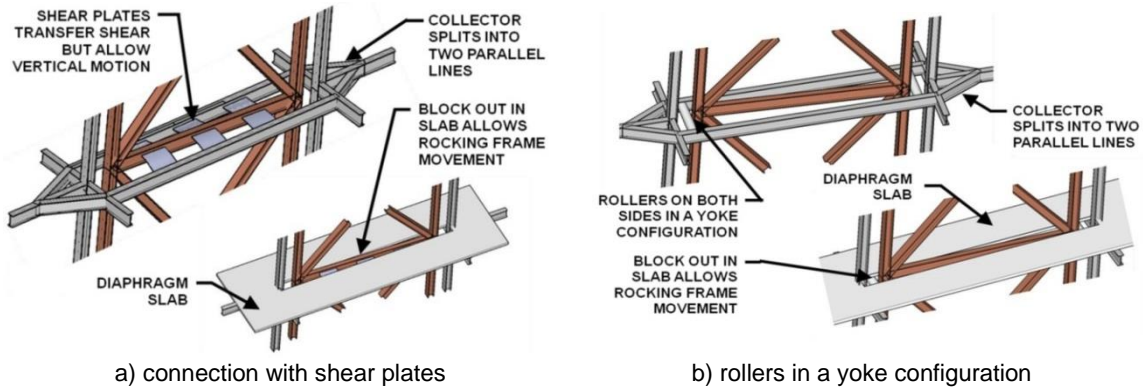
Proposed diaphragm connections for steel wall structures (Eatherton 2010)
